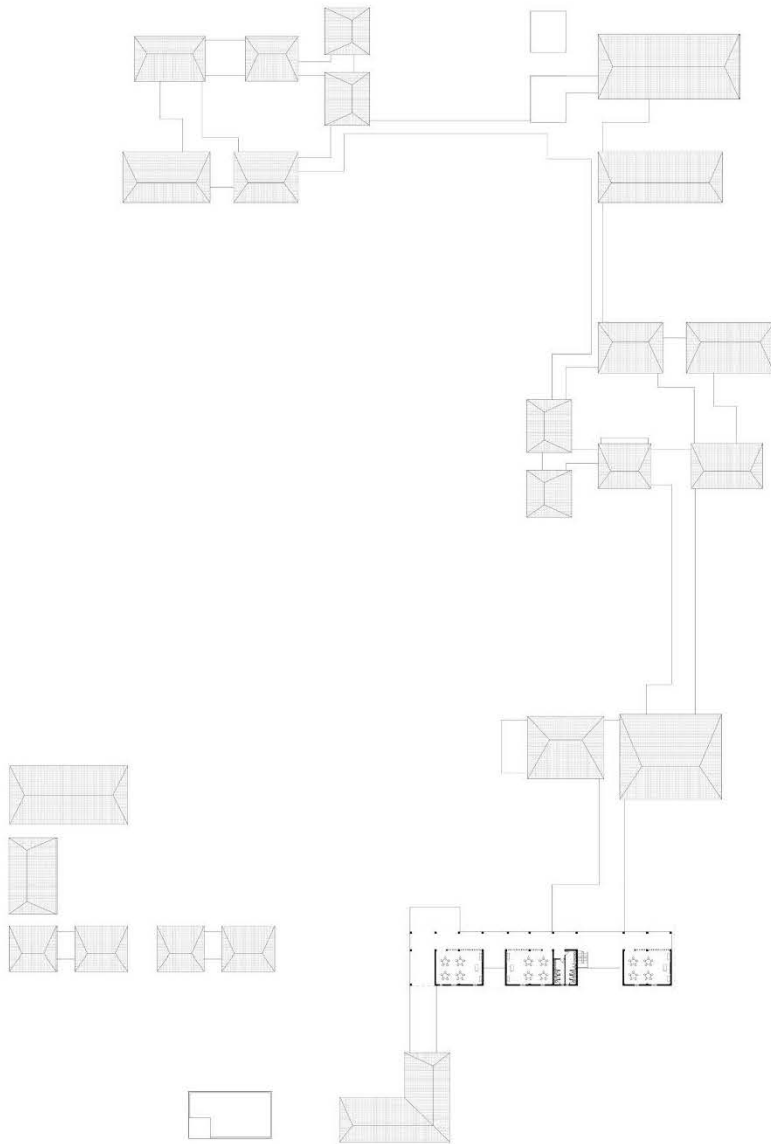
c. Second Floor Plan, *not to scale* (Author)
